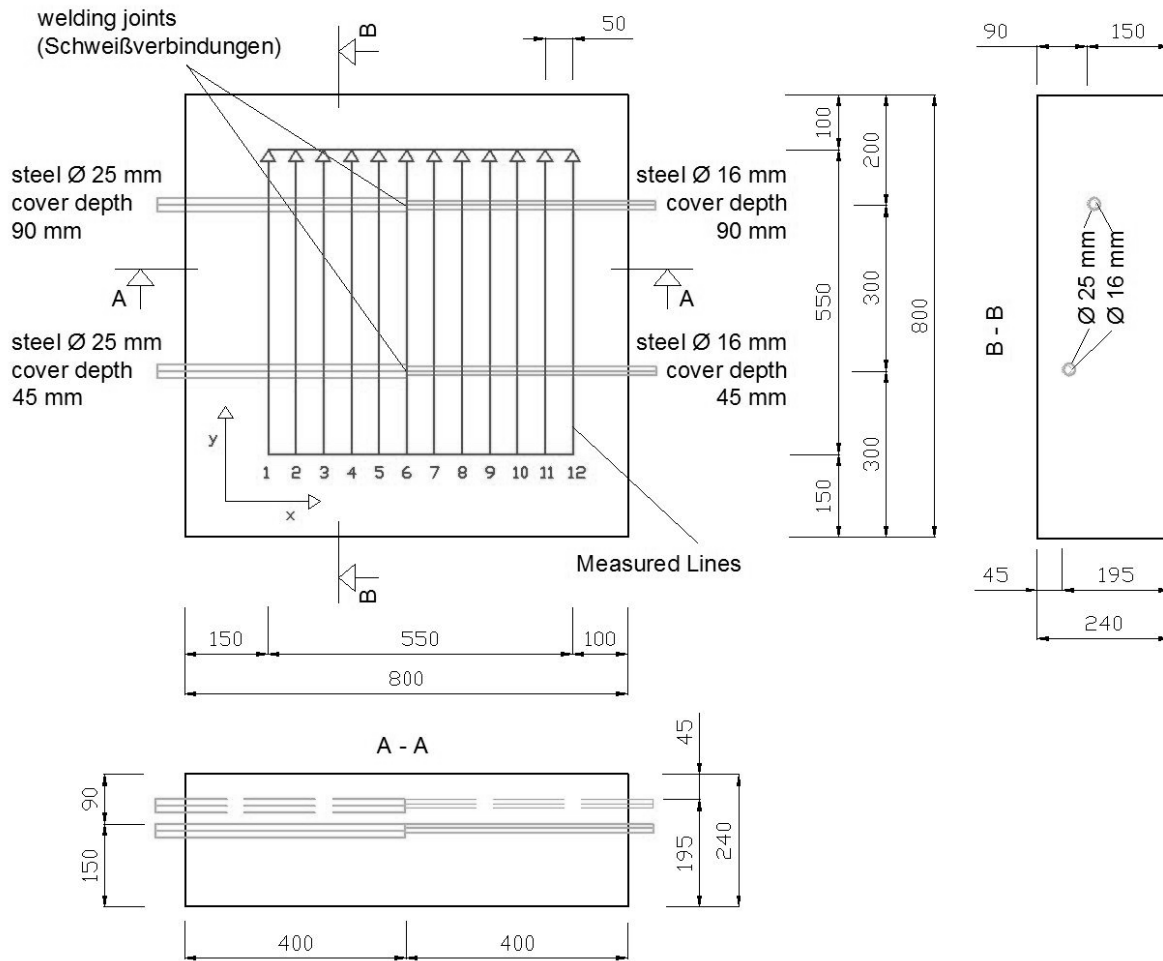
Schematic drawing of the reference specimens and the measurement grid
